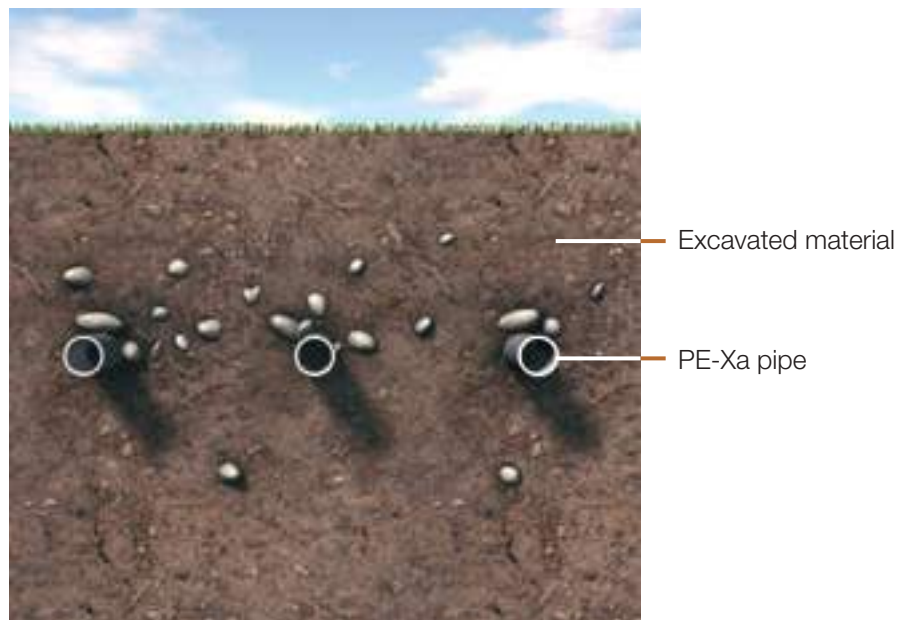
Trench cross-section, RAUGEO collect Xa and PLUS
